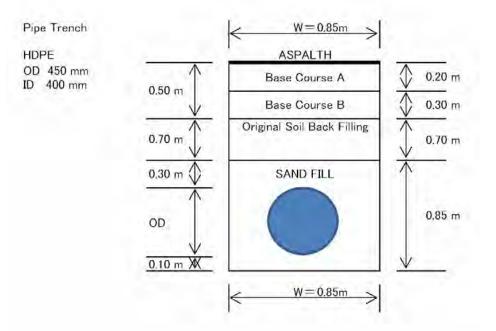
a.2 Standard Section of Pipe Earthwork for the General Open Cut Method Part
